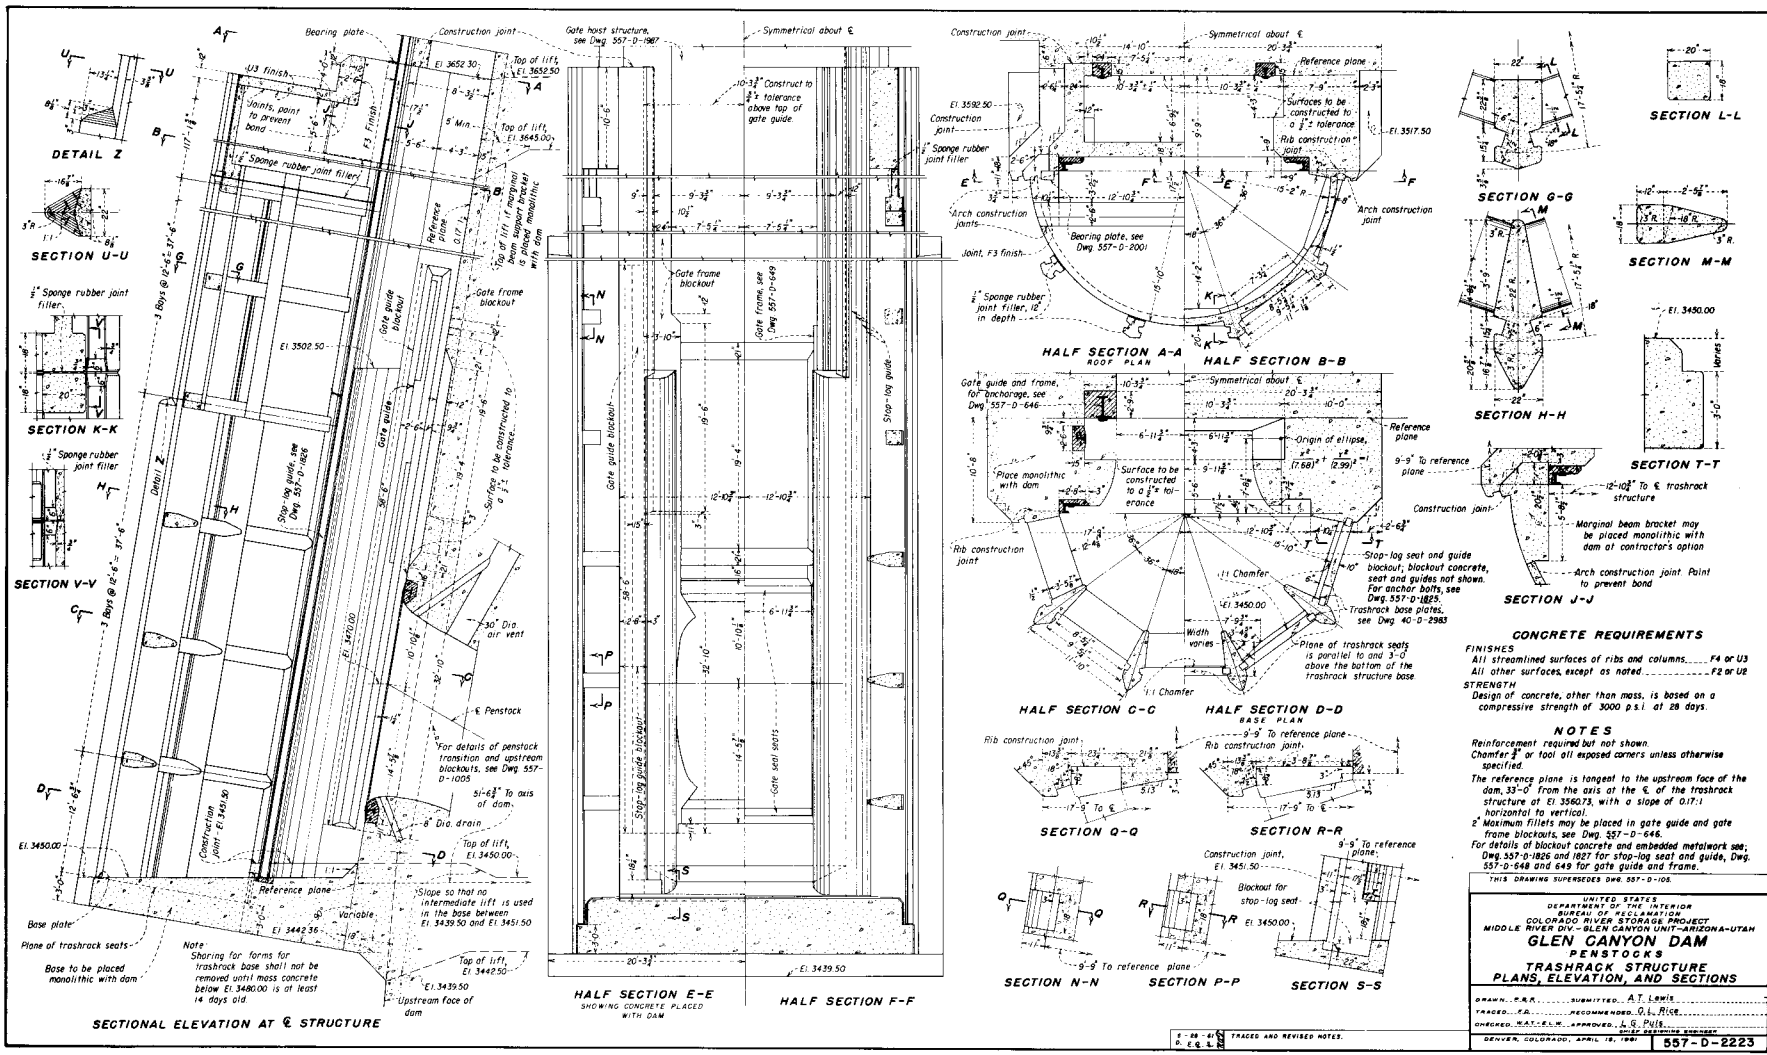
Penstocks trashrack structure—Plans, elevation, and sections.
